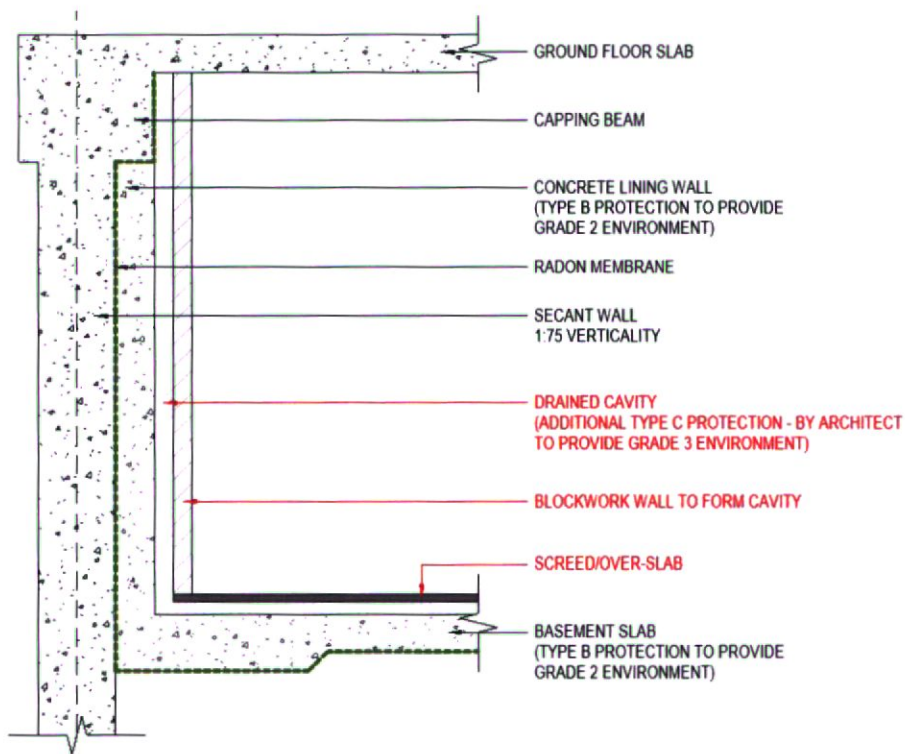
Additional Detail to Figure 15 for Grade 3 Basement Waterproofing (Architect to Specify)
